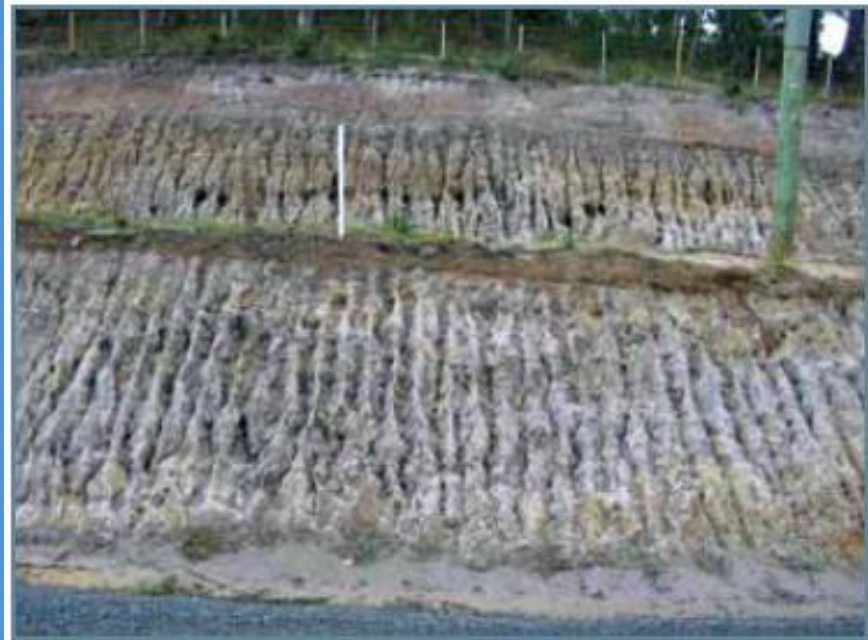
Rill and tunnel erosion caused by excavation of sodic soils for road construction. Dunalley.
